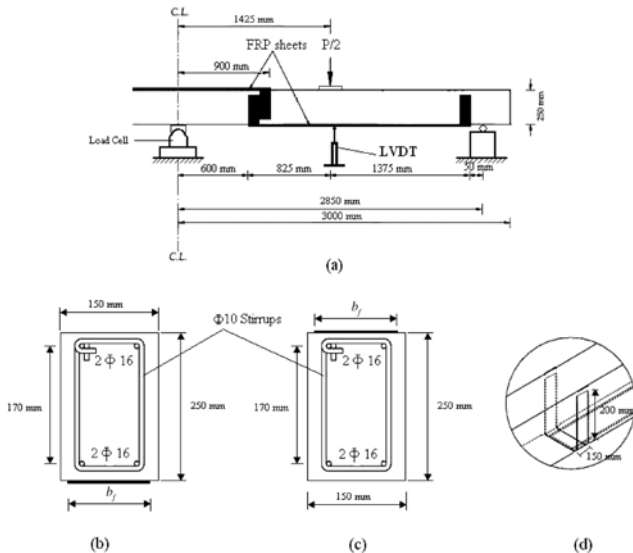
Test set-up and strengthened RC continuous beam details (a) longitudinal profile of beam (b) typical cross section of beam in sagging region (c) typical cross section of beam in hogging region (d) end anchorage system
